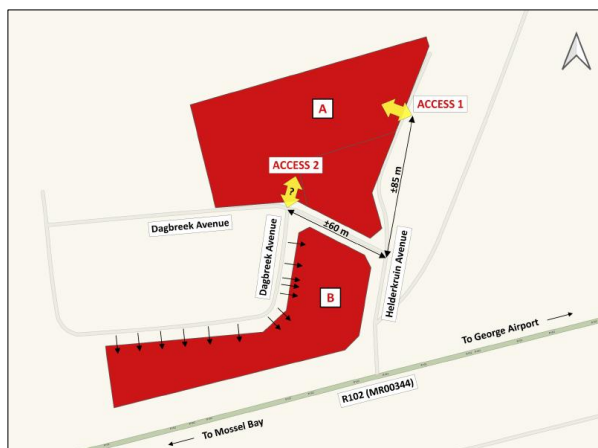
Plan to show R102 / Helderkrui Avenue intersection
